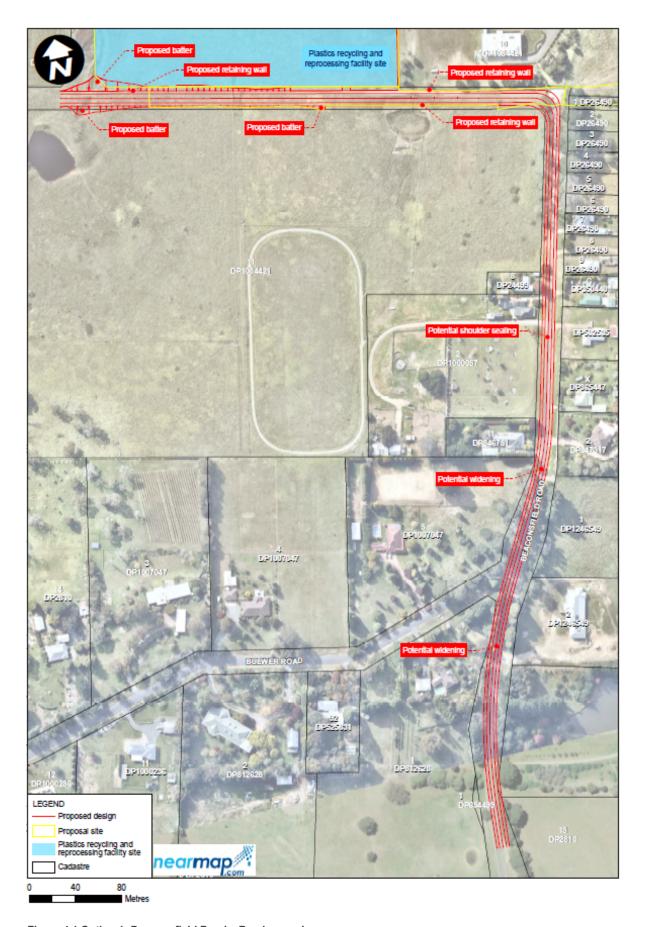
Option 1: Beaconsfield Road – Road upgrade
